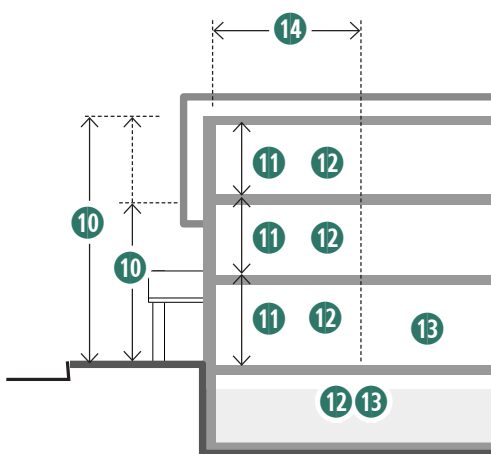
D-2. Commercial Manor Building: Height & Use Requirements
